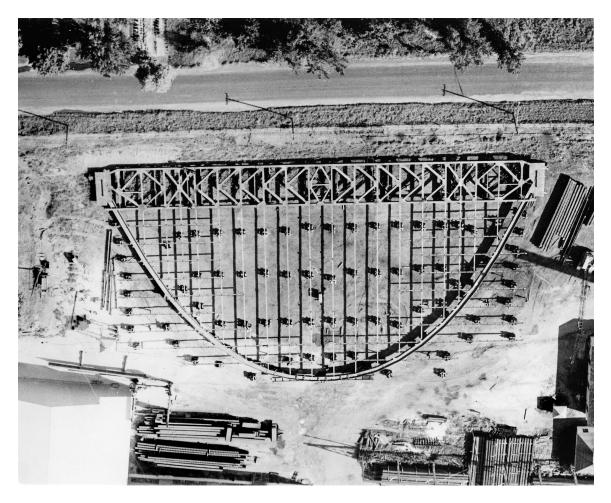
Undated photograph of catenary steel structural frame for FRBM provisionally assembled at steelyard for test fitting. Black and white print, 8 x 10 inches. Box 13, GBP, BHL.
